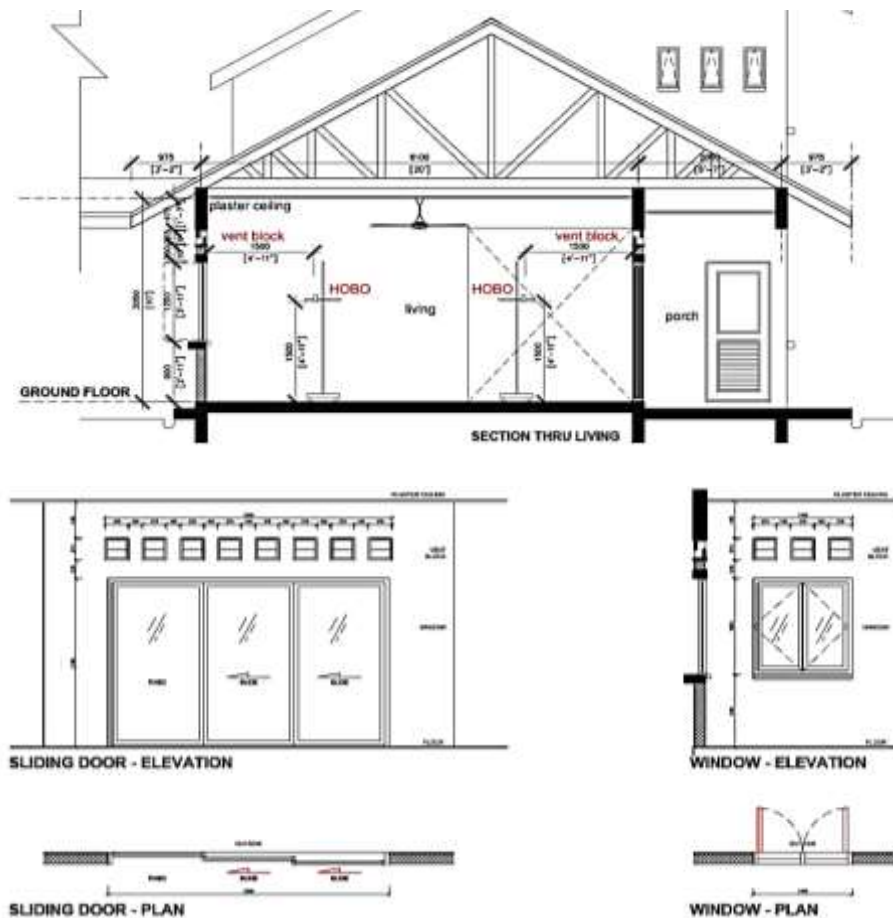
Monitoring equipment setup in the living room on the ground floor (section A-A) and ventilation block design. (Source: Authors)
